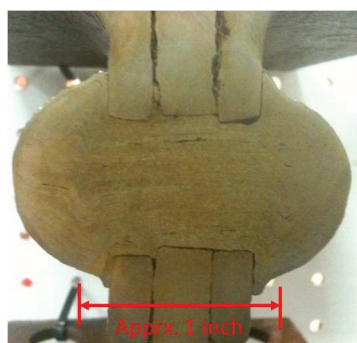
Typical hot-driven, wrought iron, riveted connection cross-section.
